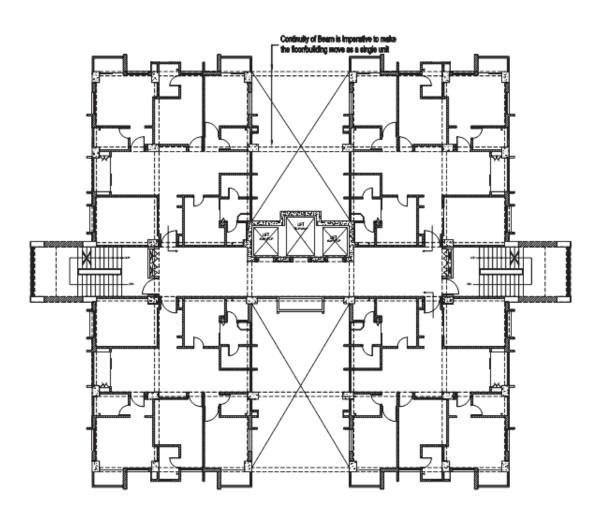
Beam Continuity Requirement when Diaphragm Discontinues
